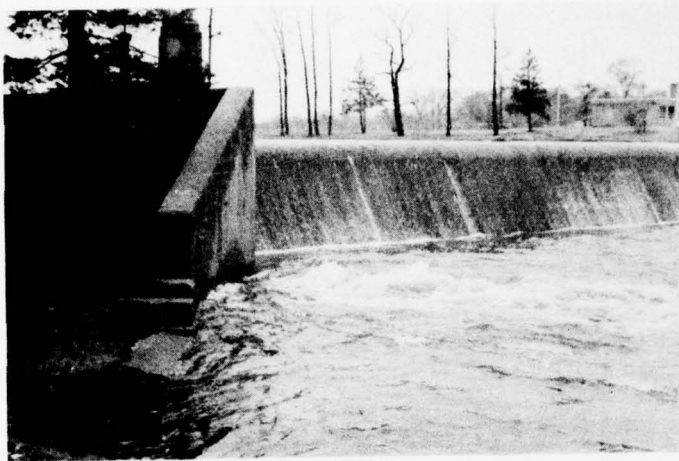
View of the right abutment wingwall; the left low level outlet conduit is discharging, causing white surface water in the stilling basin area; Stilling basin apron is submerged under tailwater
